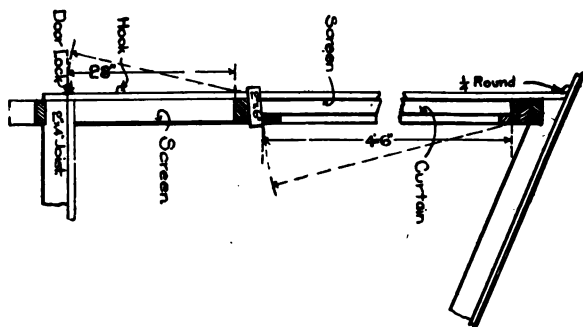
Detailed construction of the front windows and screens of the Iowa movable colony house.
